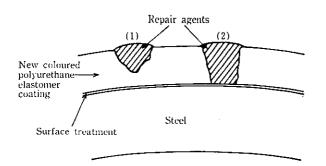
Repair methods of damaged areas of new coloured polyurethane coated steel structures
